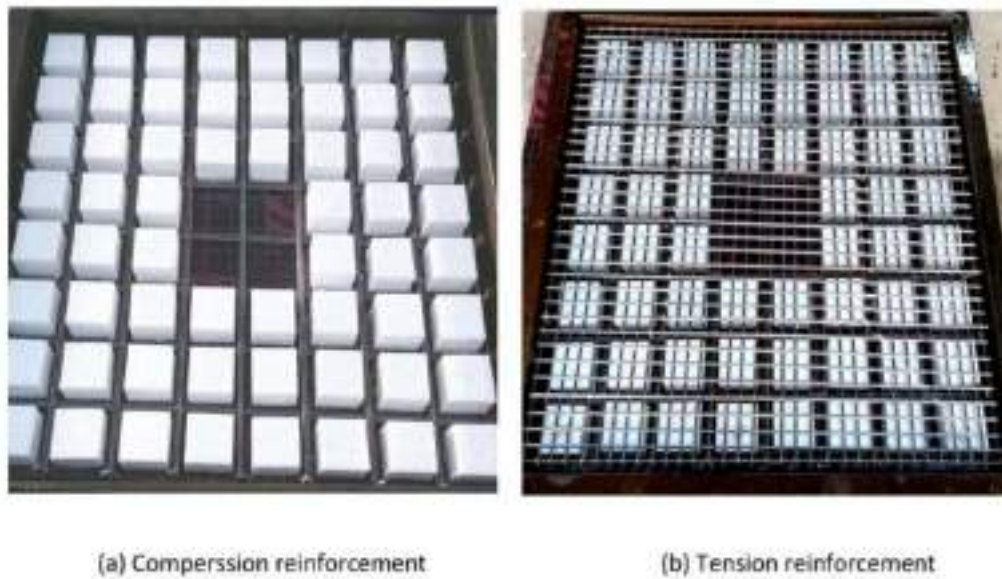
2 Waffle slab Steel reinforcement of IWS1.
